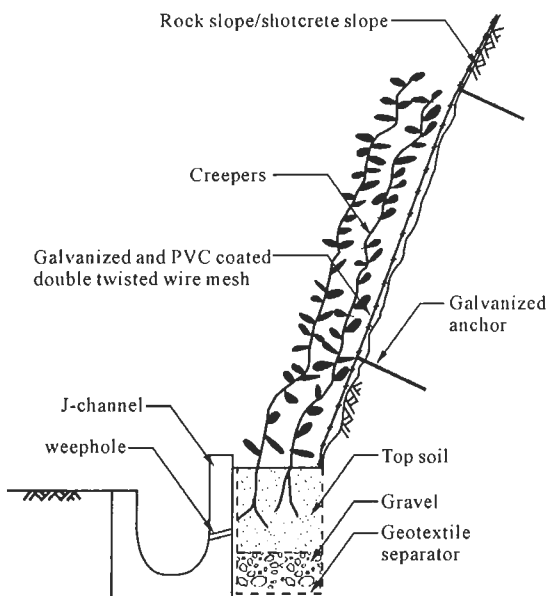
Planting details for rock slopes and steep slopes with shotcrete surface
